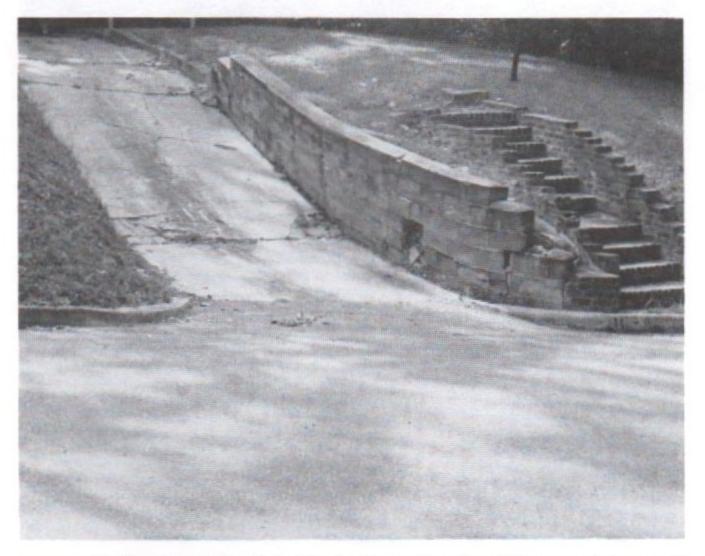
Horizontal and vertical movement damaging retaining wall and driveway.
